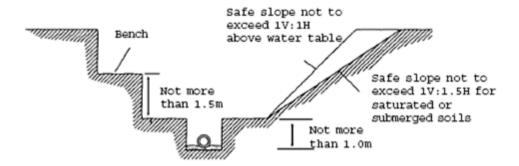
Excavation Faces Benched and Battered to a Safe Slope.
